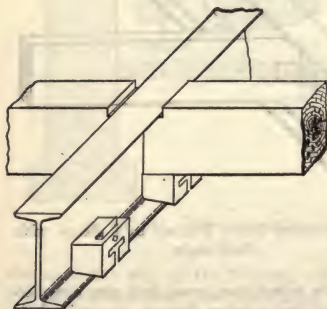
Wooden Beam Framed to I Beam with Duplex Box-hanger
